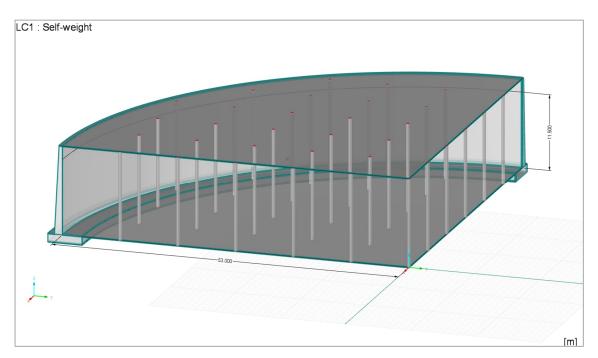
Type1 - Conventional above ground post-tensioned circular reinforced concrete reservoir
